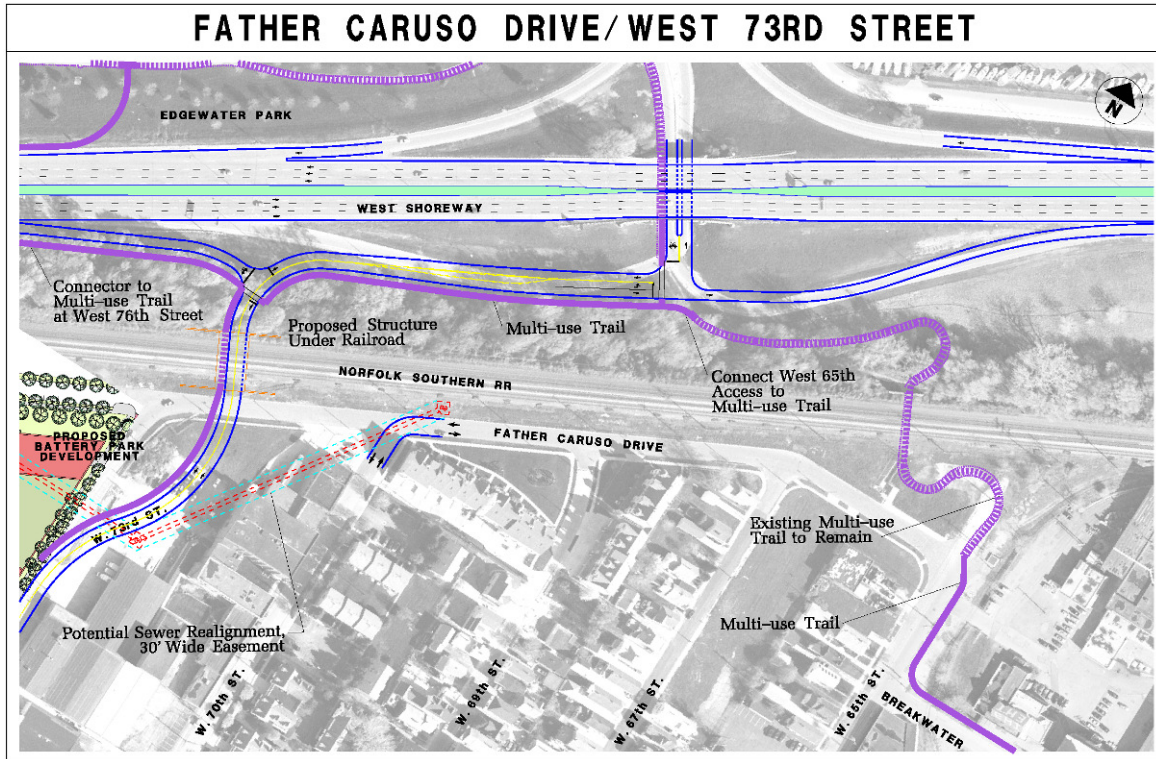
West Shoreway Boulevard at Father Caruso Dr./W. 73rd St.
